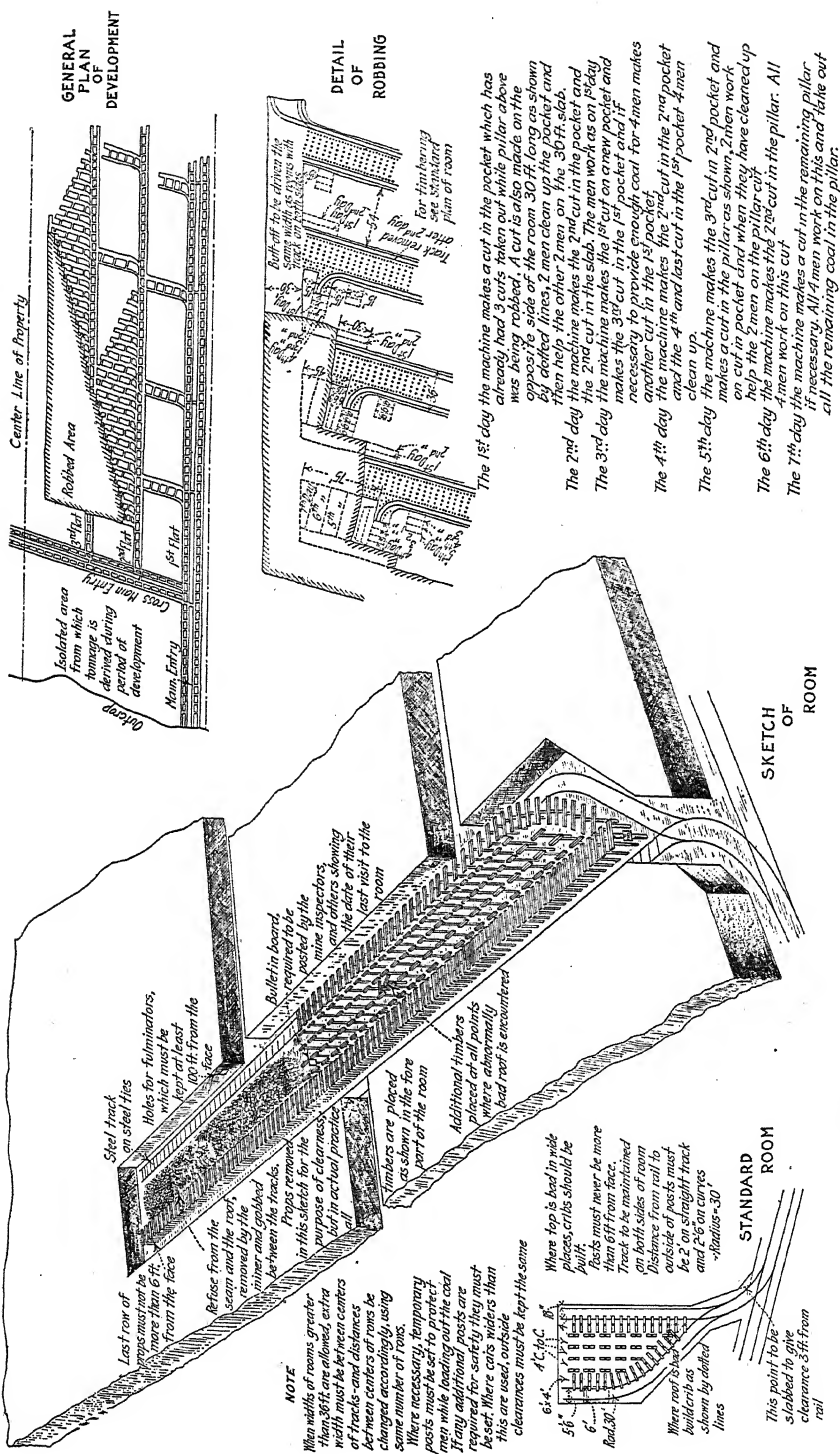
ADVANCING SYSTEM OF MINING, WITH ROOMS 36 FT. WIDE AND 400 FT. LONG. , UNITED STATES COAL & COKE CO., GARY, W. VA.
